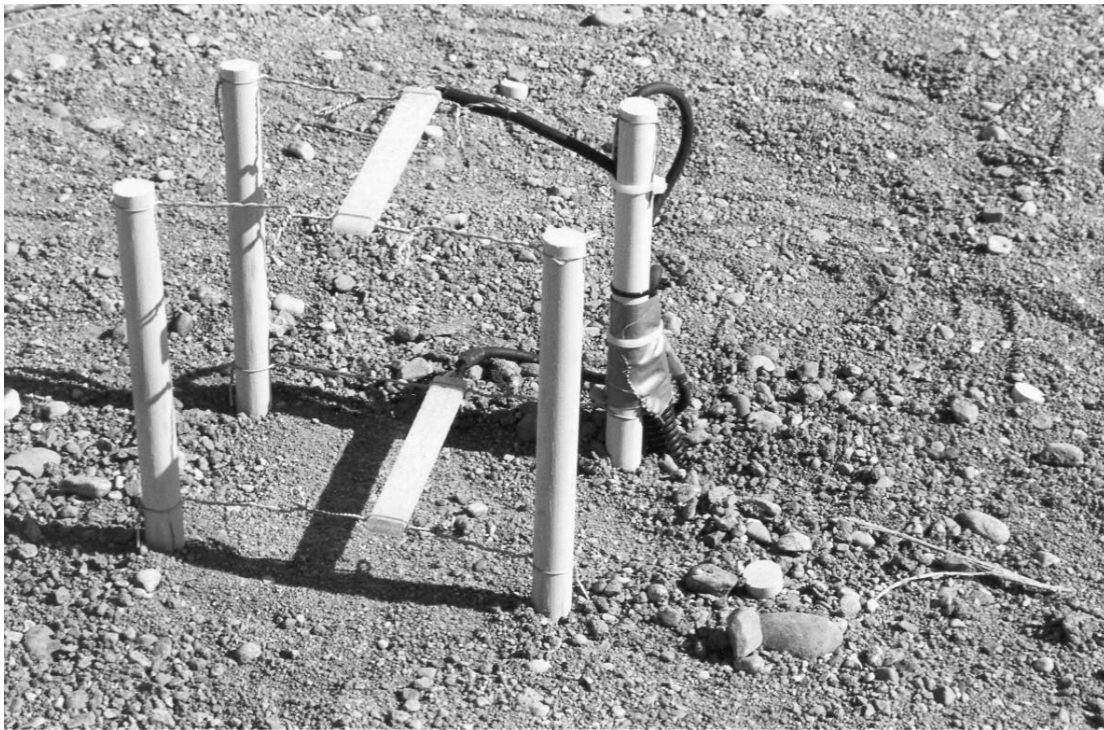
Current mounting technique for embedded strain sensors in concrete pavement at MnROAD.
